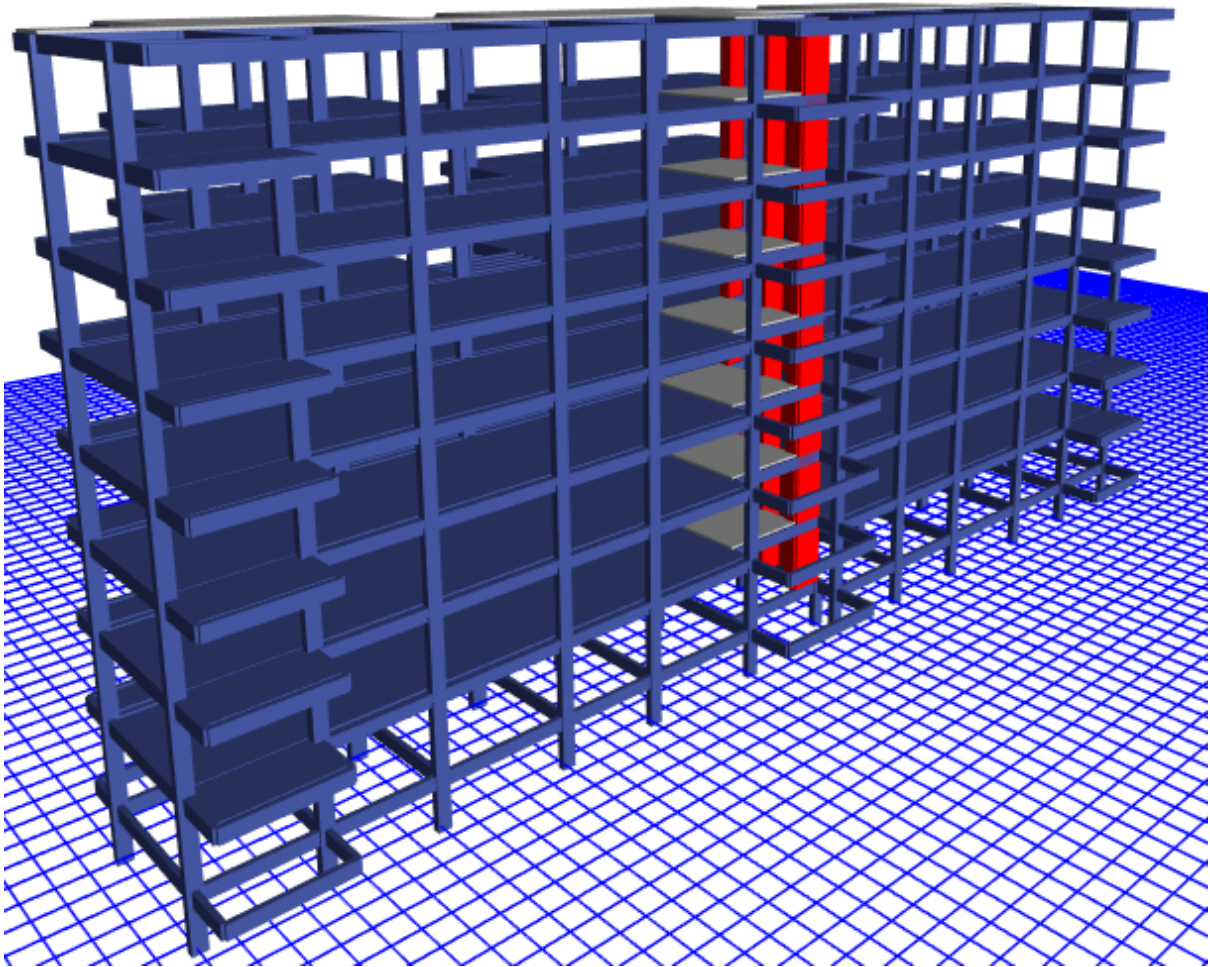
Three dimensional Eight Storey RC Building with Shear Wall
